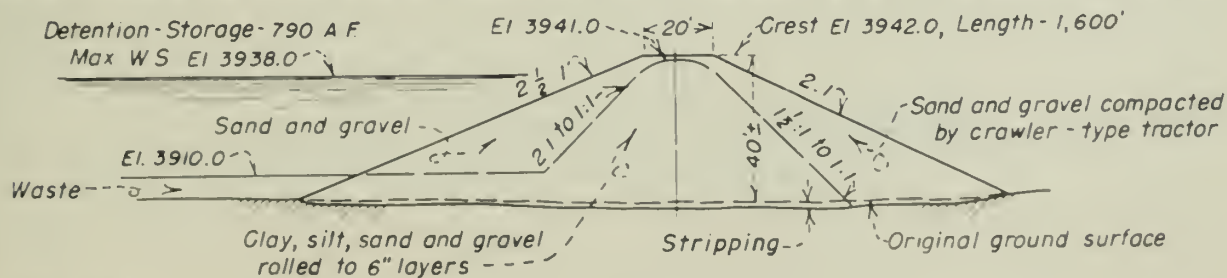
Picacho North Dam, a detention dam located on the North Branch of Picacho Arroyo, N.Mex. (Constructed 1953-54.) From drawing No. 103-D-586.
